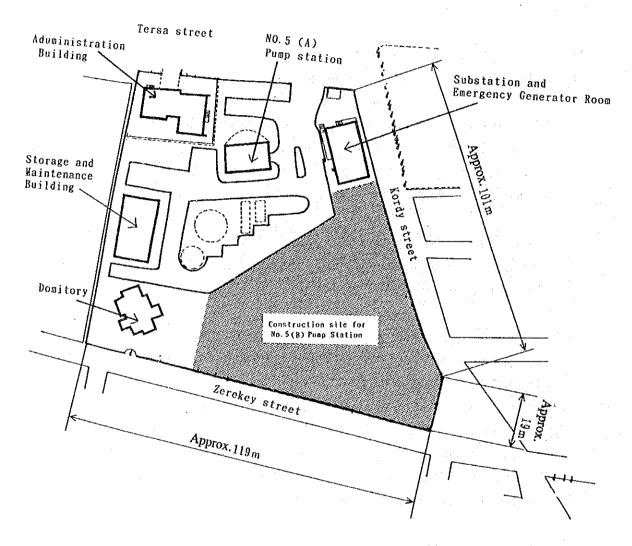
Site Layout of Sewer Transfer Pump Station No. 5
